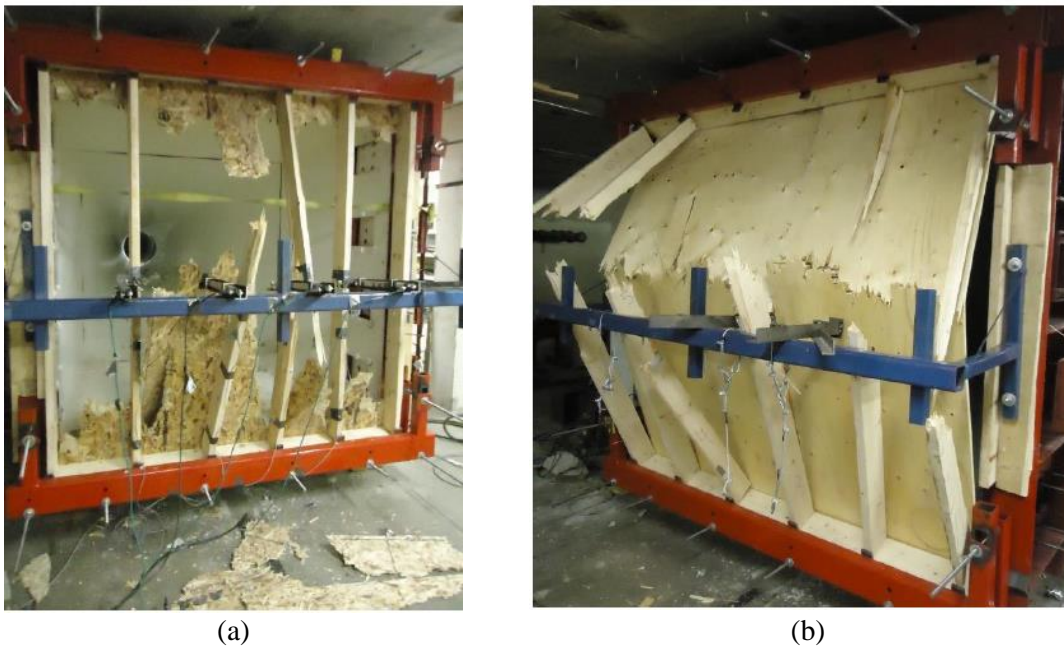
Light-frame wood stud walls subjected to shock tube testing: (a) OSB sheathed wall; (b) Plywood sheathed wall (Viau and Doudak 2015)
